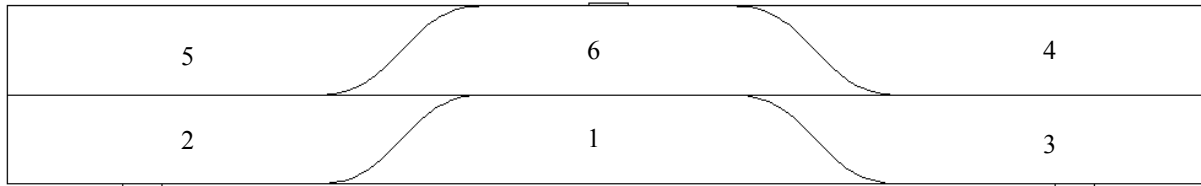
Side view of specimen showing placement order of fresh concrete
